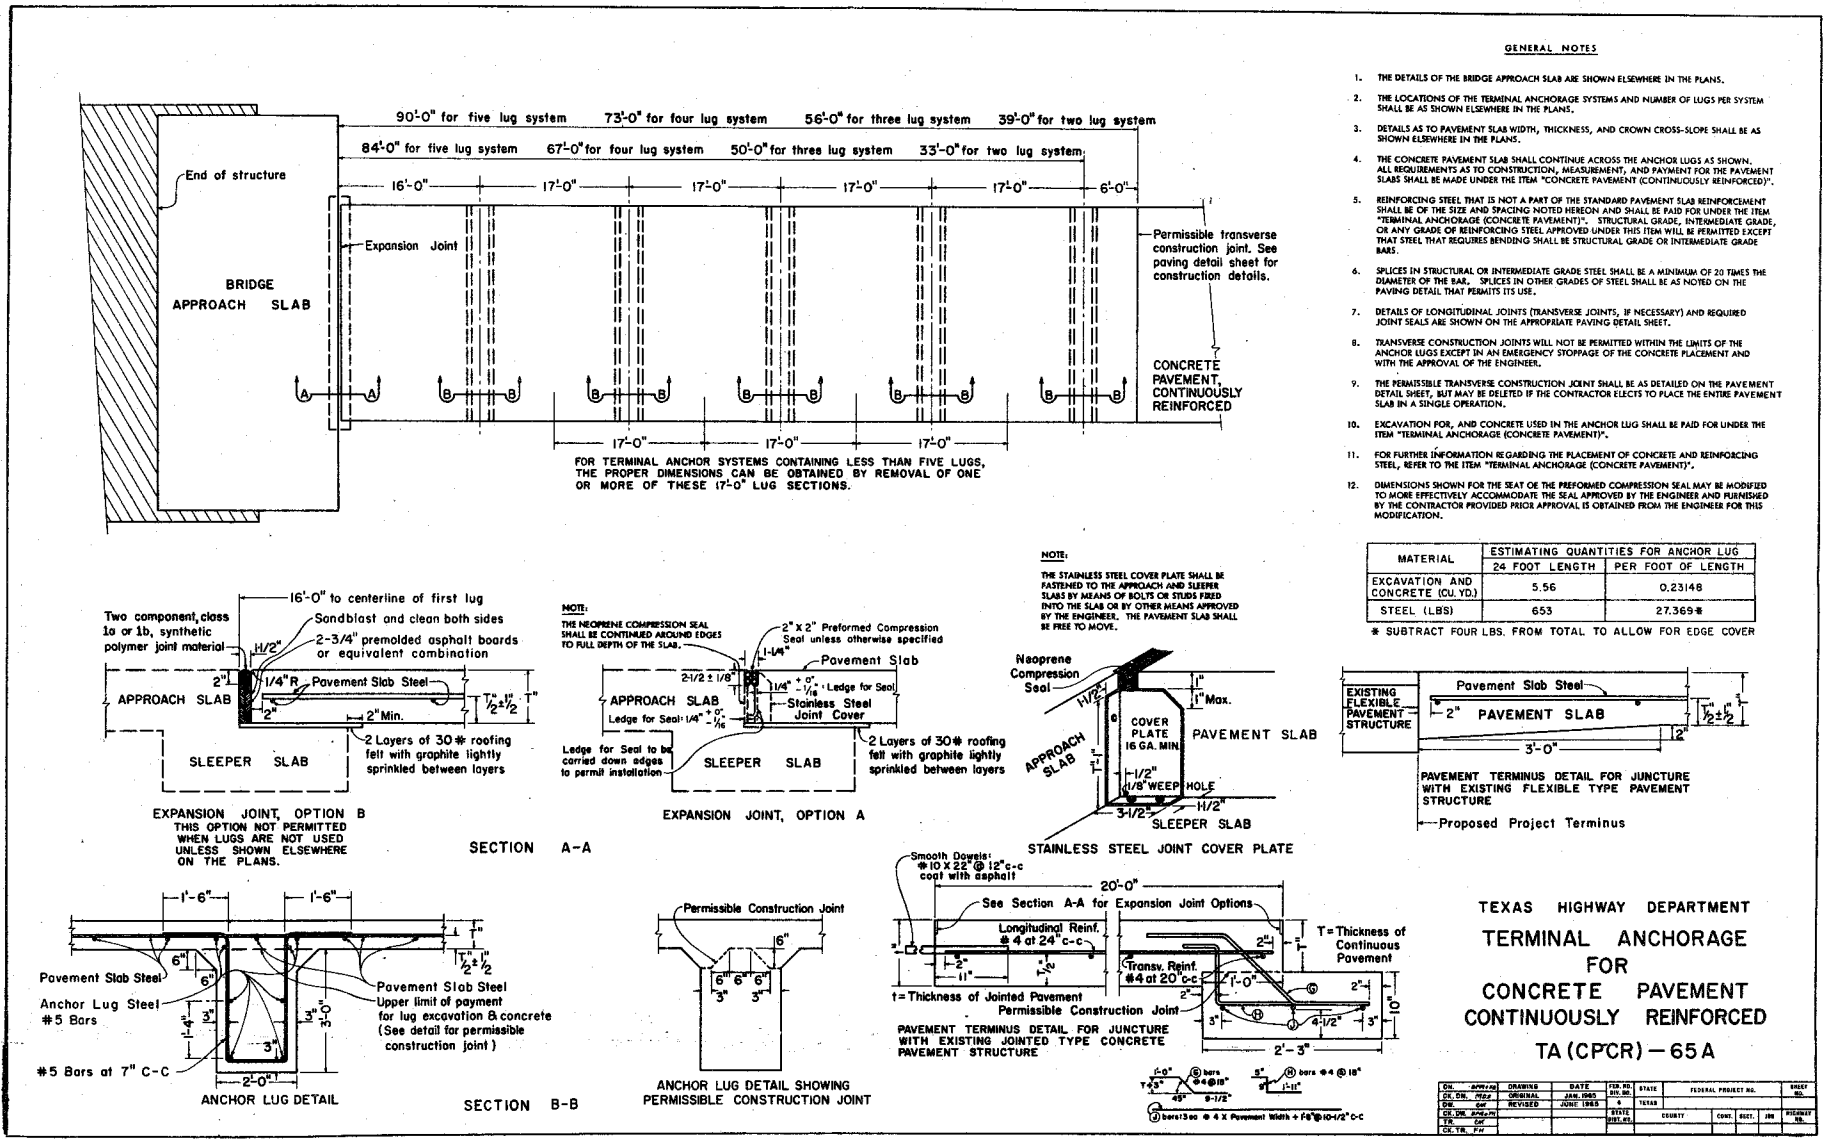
TERMINAL ANCHORAGE FOR CONCRETE PAVEMENT CONTINUOUSLY REINFORCED, TA(CPCR)-65A
